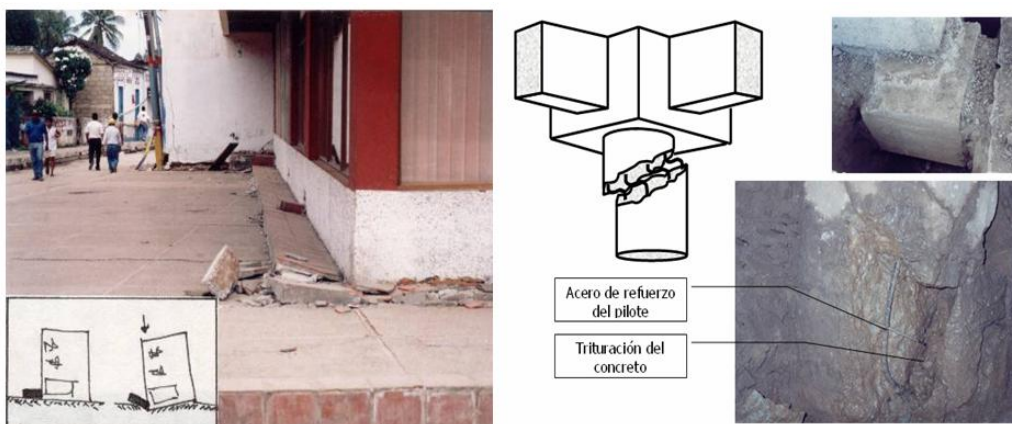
Failure of foundation system and drift concentration under the restrained level
